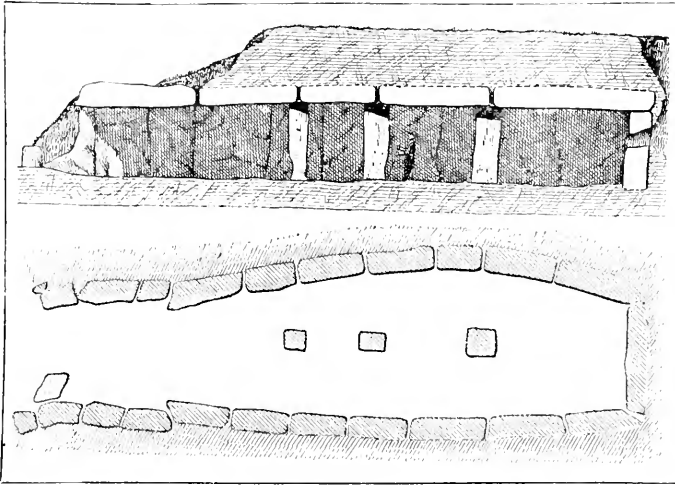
COVERED PASSAGE OF ANTEQUERA—SECTION AND PLAN.
